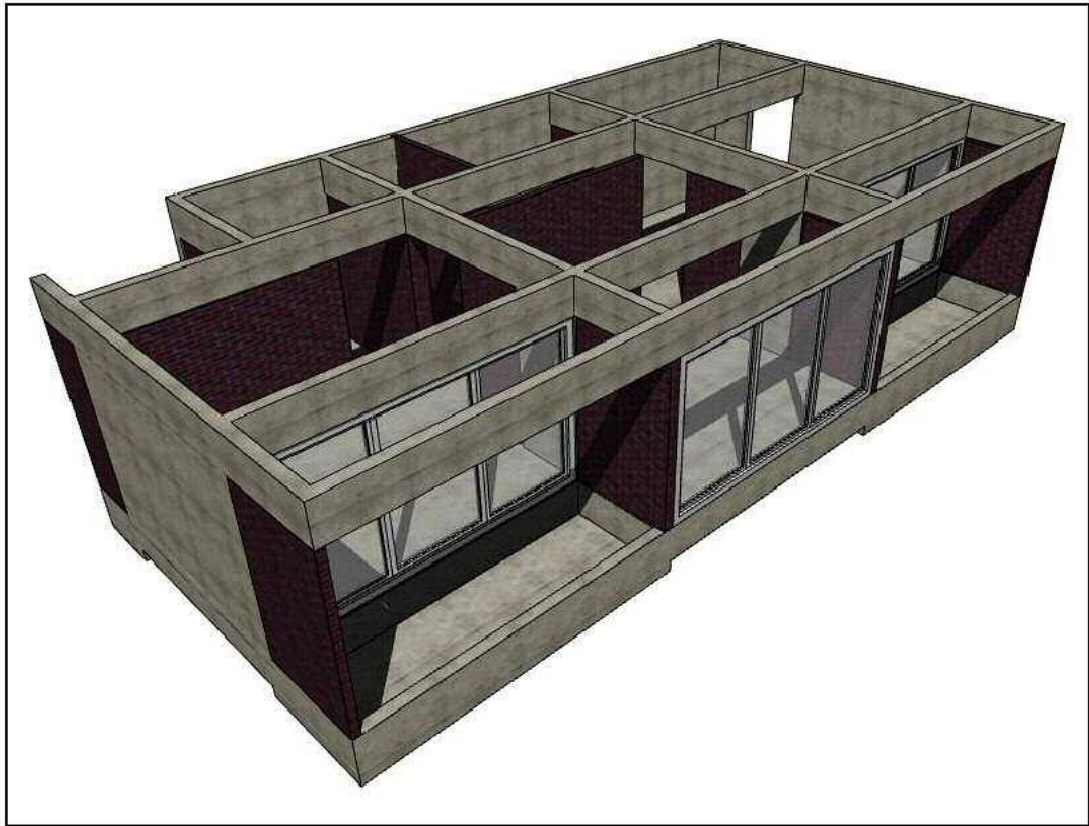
3D floor plan of a 82m² flat from a 20-floor apartment building in Mumbai
